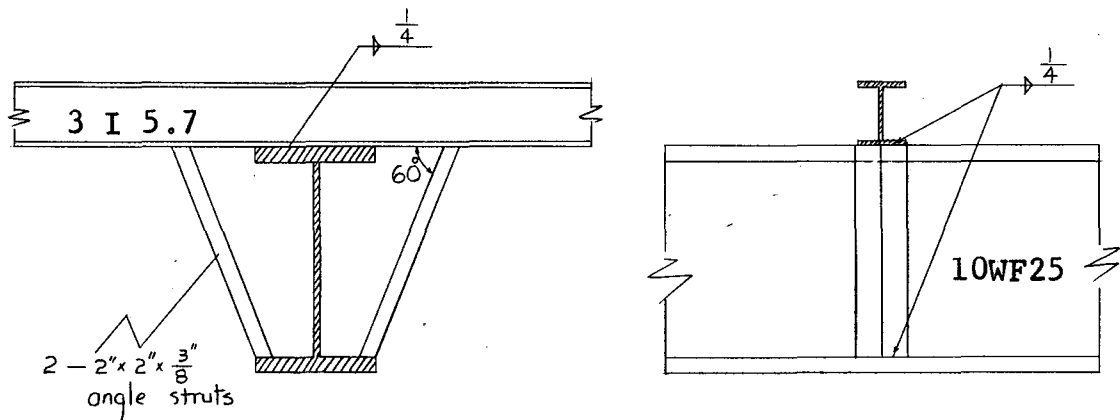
LB-28 Beam without stiffeners. Purlins connected to the tension flange of the beam by angle struts.
